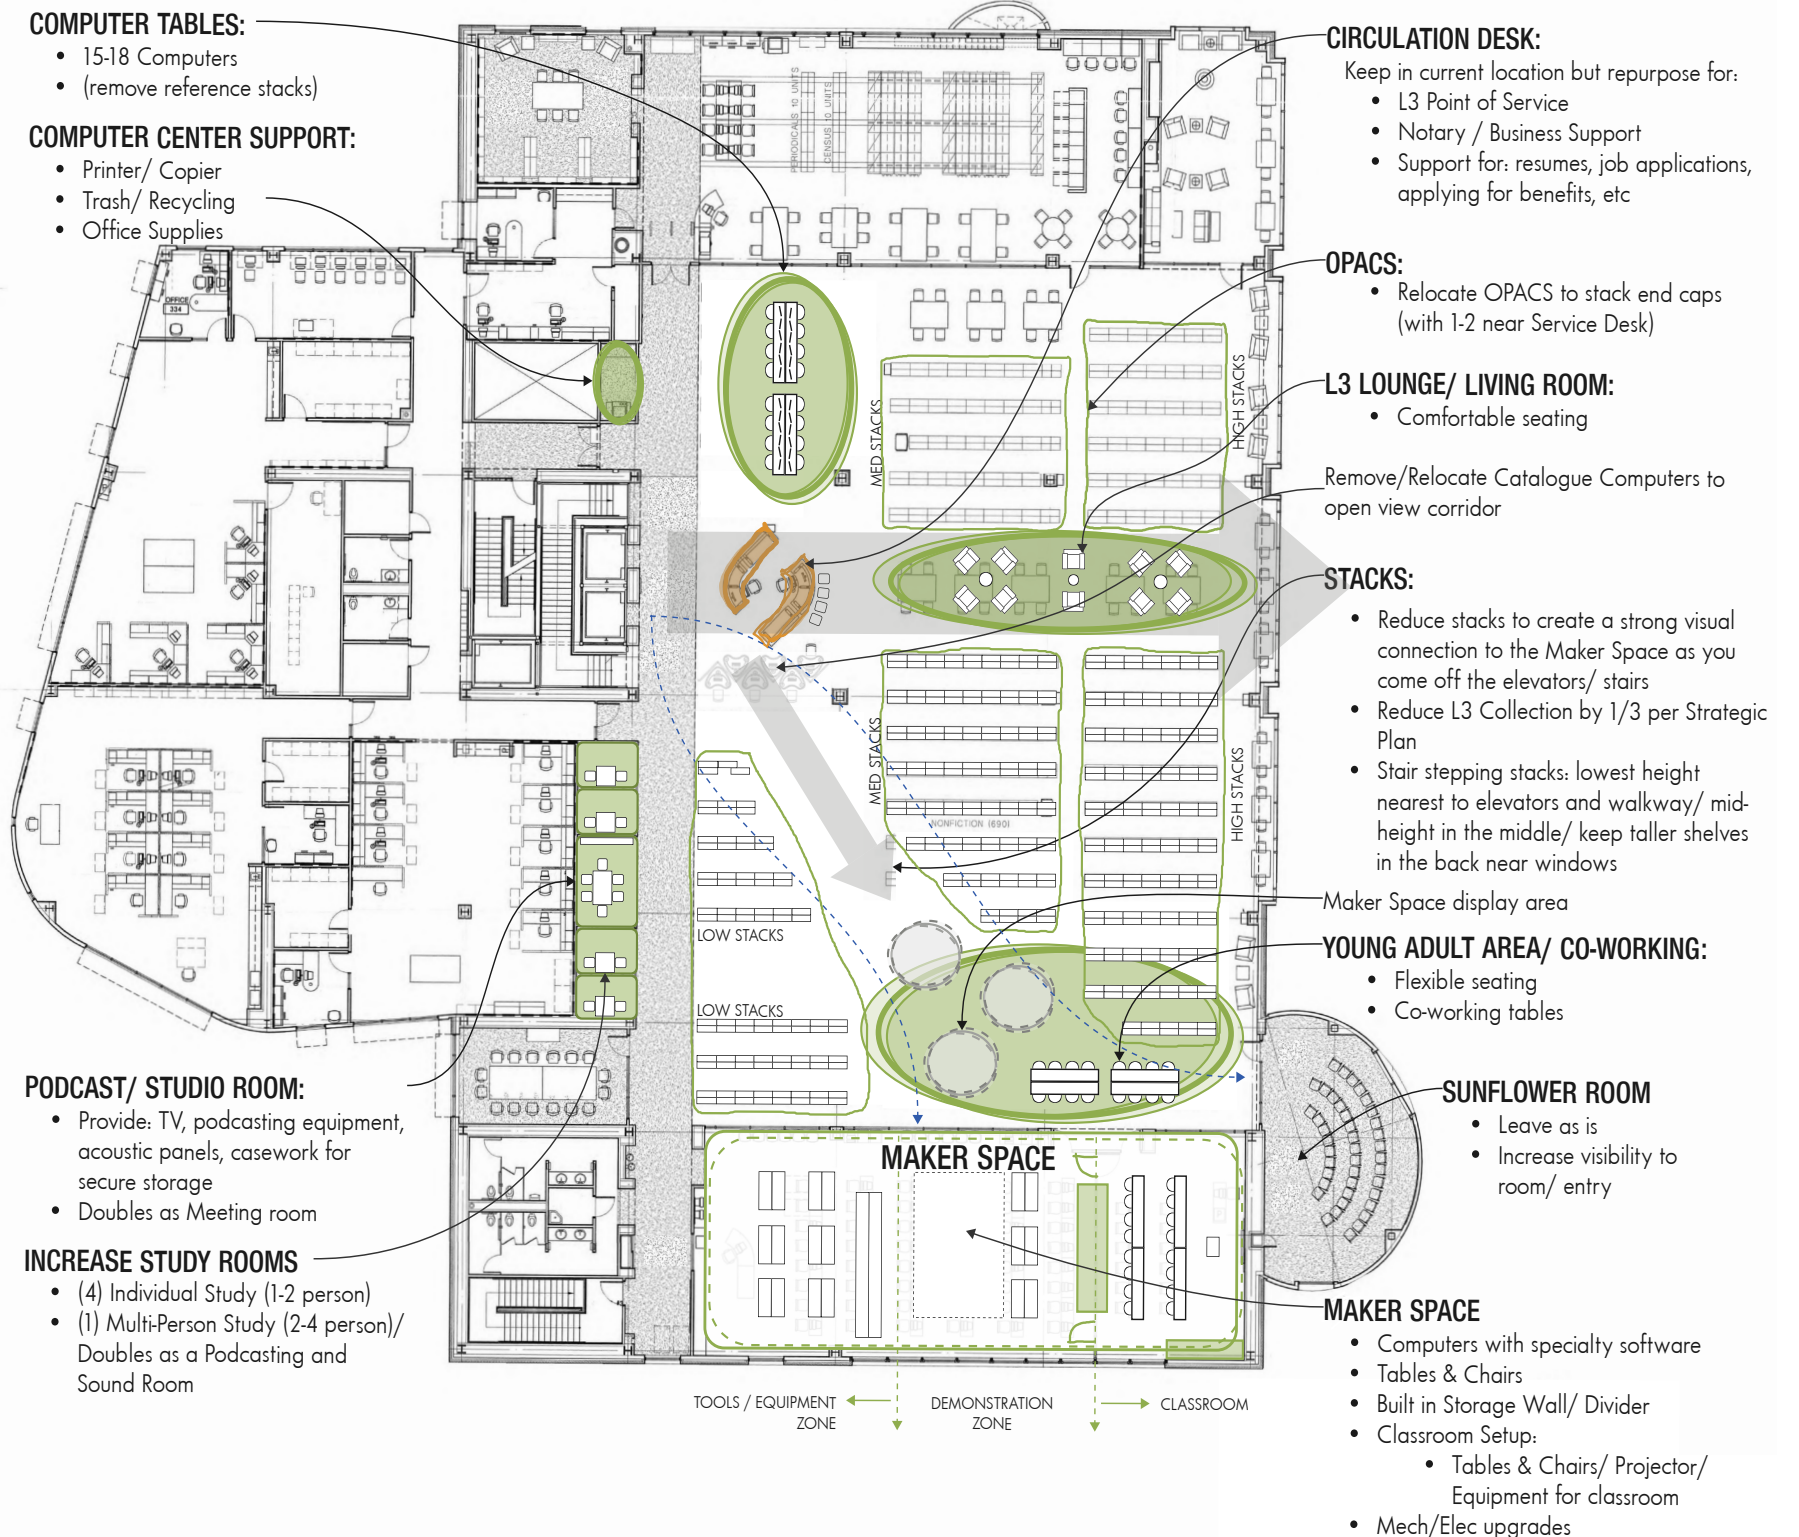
CHEYENNE BRANCH , THIRD FLOOR PLAN, OVERLAY BY JLG ARCHITECTS
